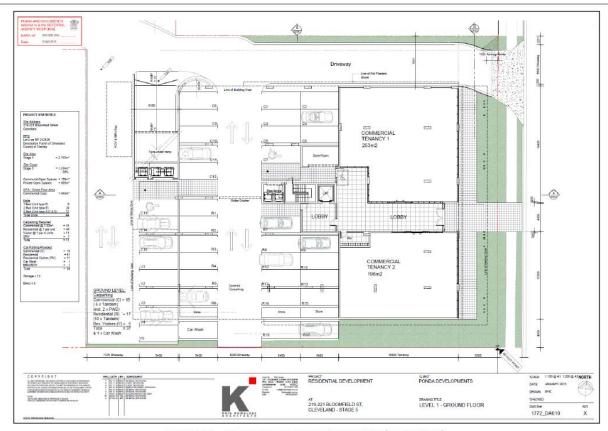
APPROVED GROUND FLOOR PLAN (PRECINCT 5)
